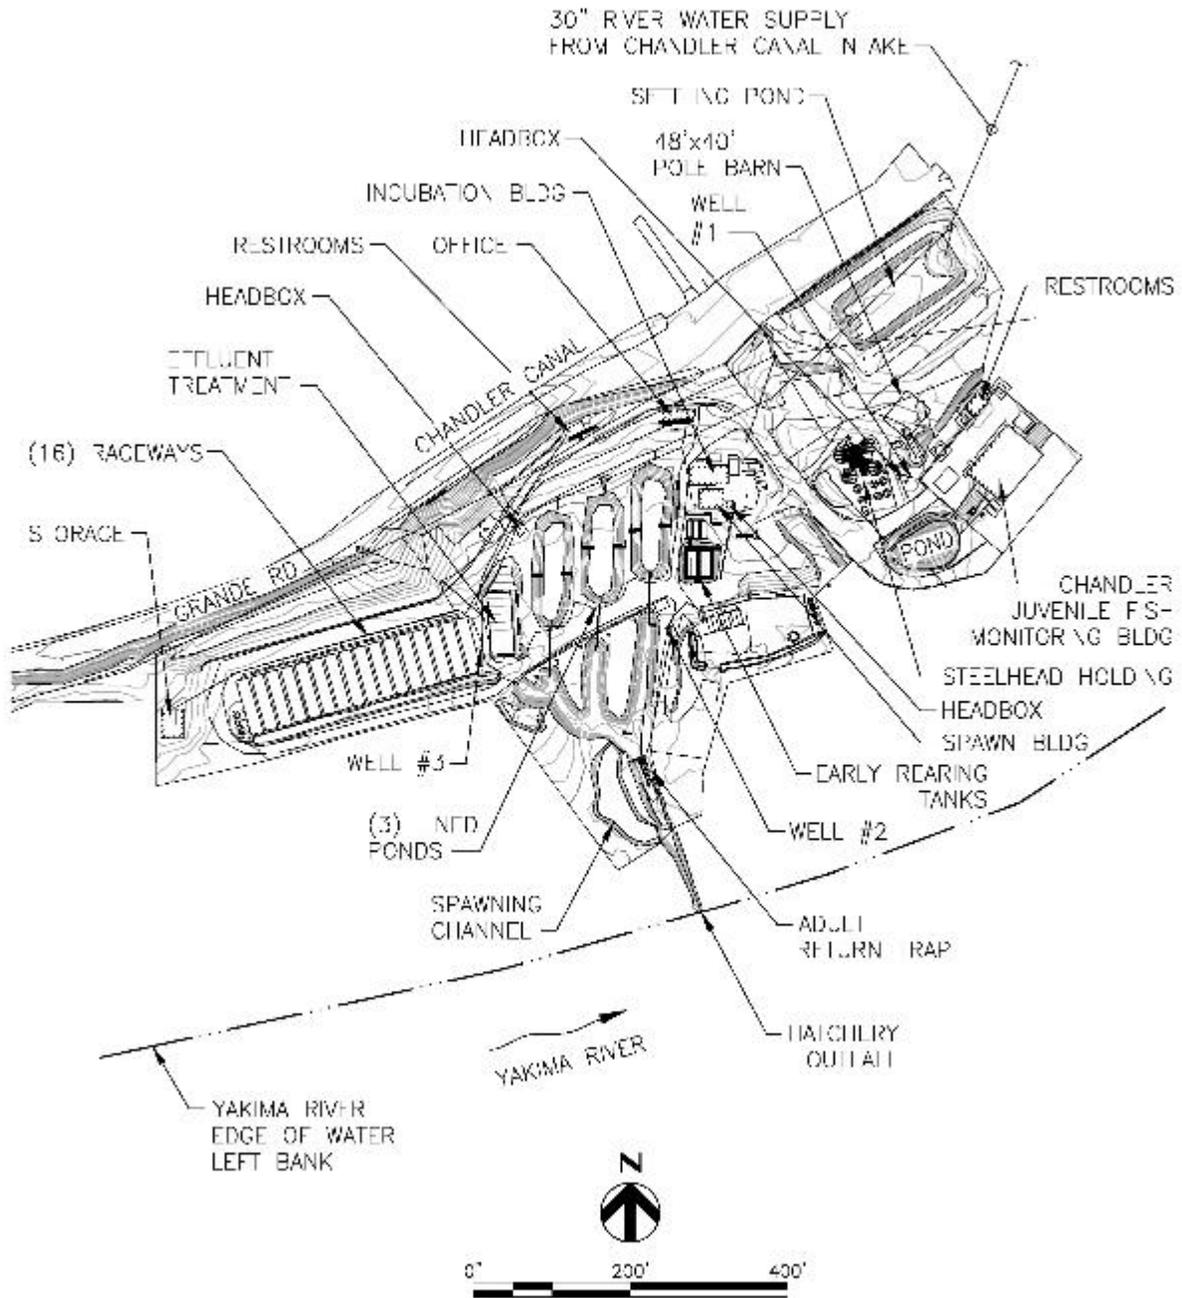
Plan view of existing facilities at Prosser Hatchery
